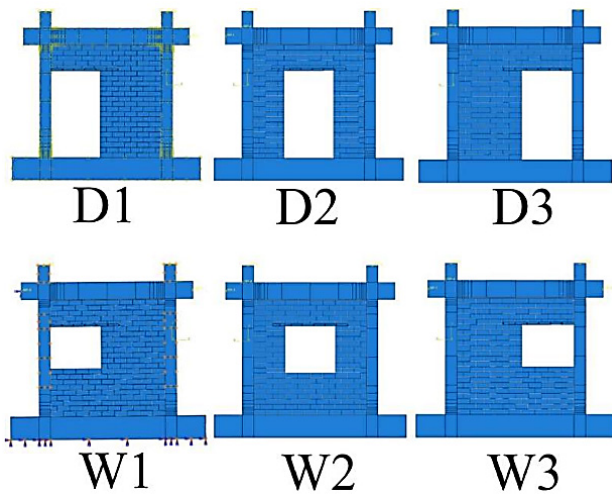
Naming convention for different sizing and positioning of openings in the RC frame with masonry infill
